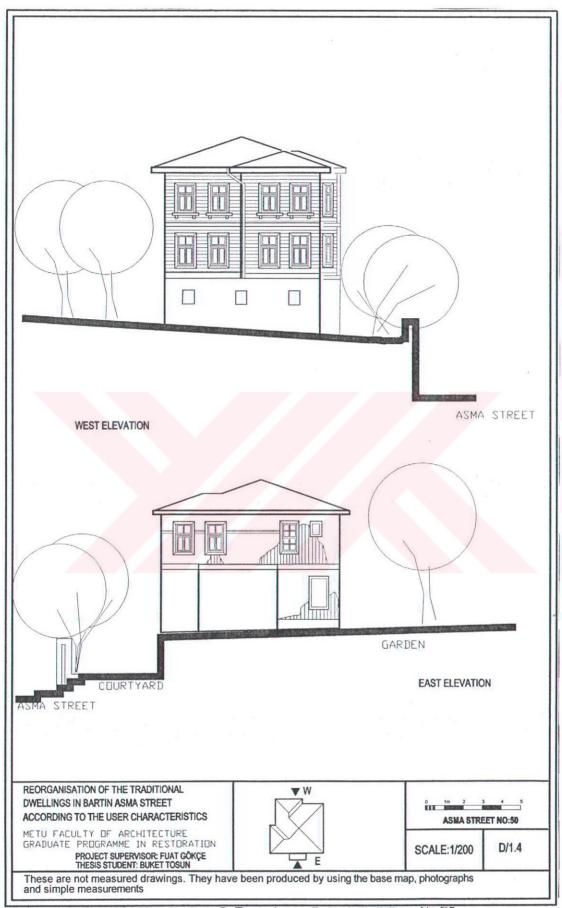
Sketch Drawings of Facades of the Building No:50
